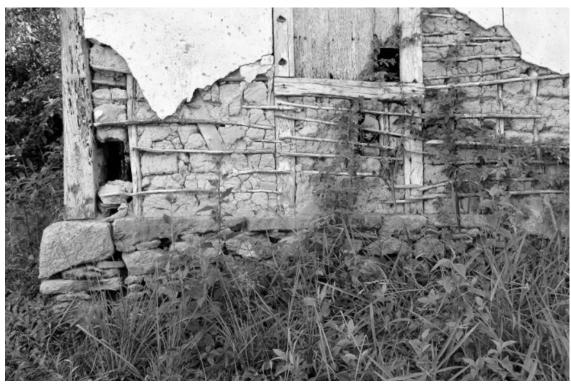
External wattle and daub wall on stone foundation, Cachoeira do Brumado District, Mariana, MG, 2014. (Source: Image sourced from the website Vitruvius.]
